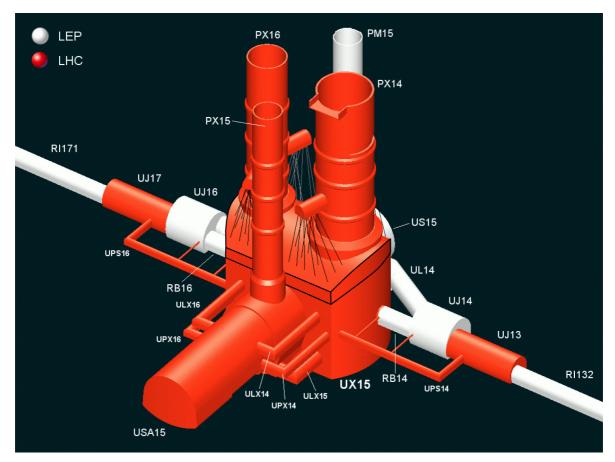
Point 1 underground isometric view, displaying the UX15 cavern vault anchoring system
